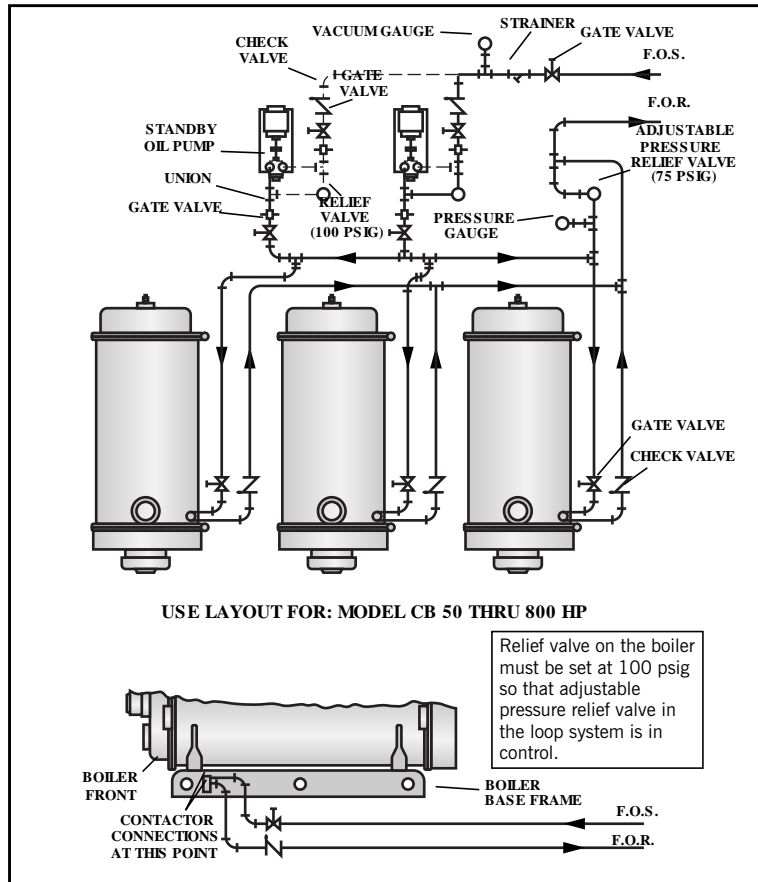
No. 2 Oil Piping, Multiple Boiler Installation
